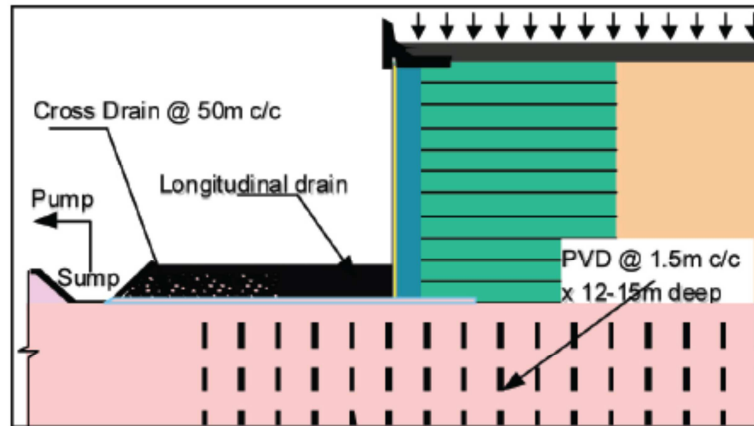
Cross section of MSE wall and PVD arrangement from Biswas and Adhikari (2006)
